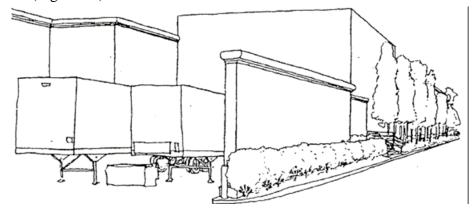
Screening for loading Docks Using Walls/Fencing & Landscaping
